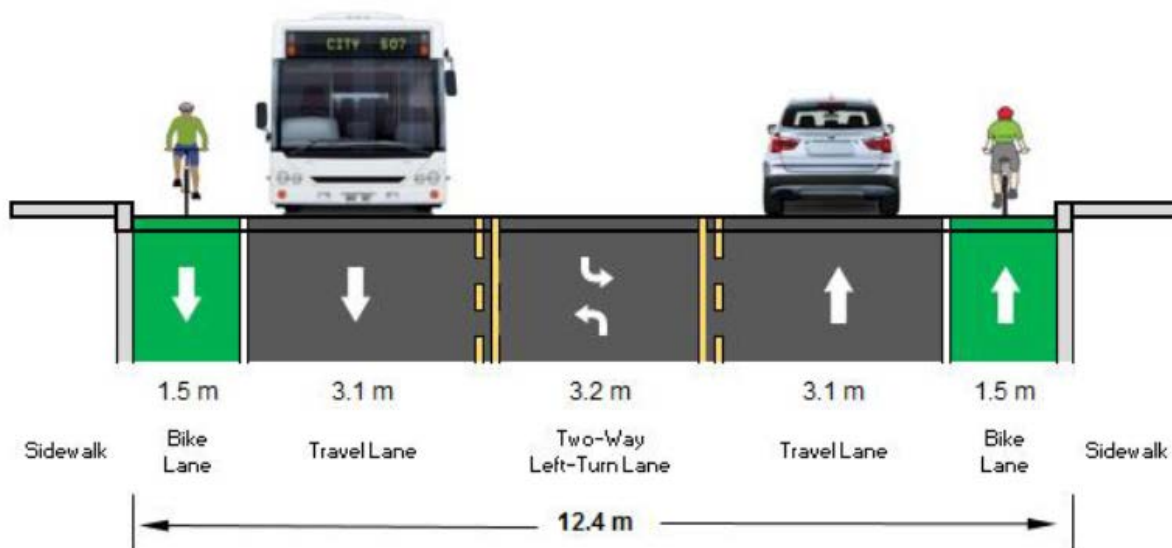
Proposed Road Diet Configuration between Great Northern Road and Pine Street
